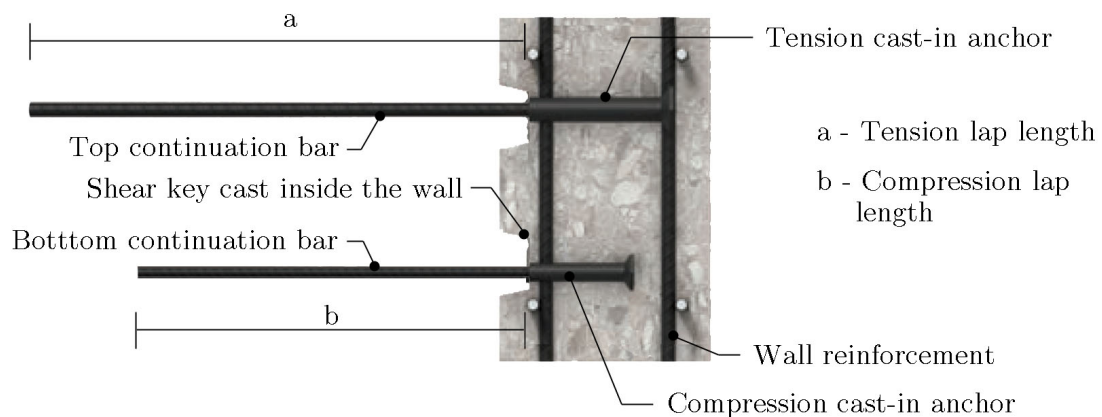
Cast-in Anchor Continuation Bar Anchorage Detail (reworked from Ancon Building Products (2014))
